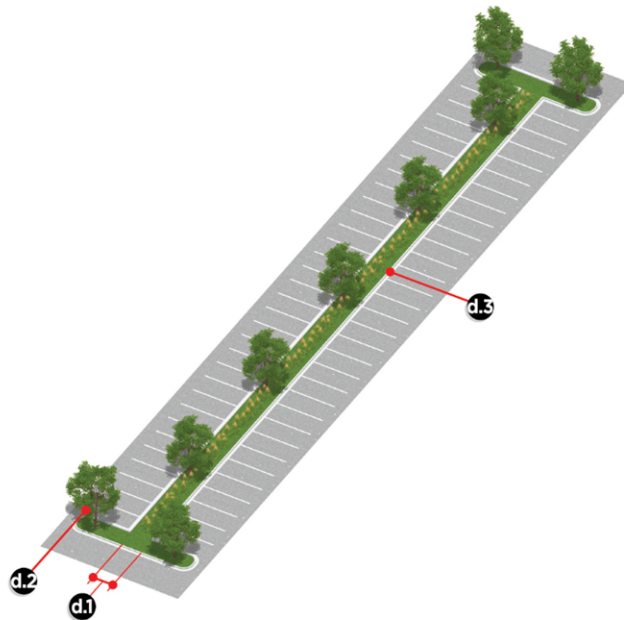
Parking Lot Interior Area Landscape Amount Standards
